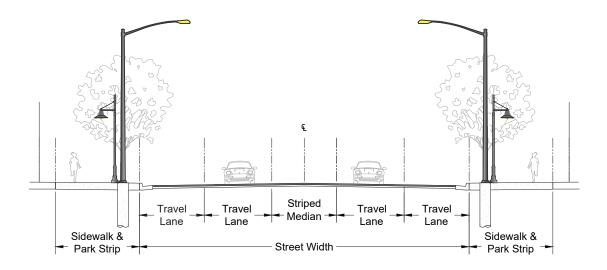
Typical Collector with Continuous Street and Pedestrian Lighting
